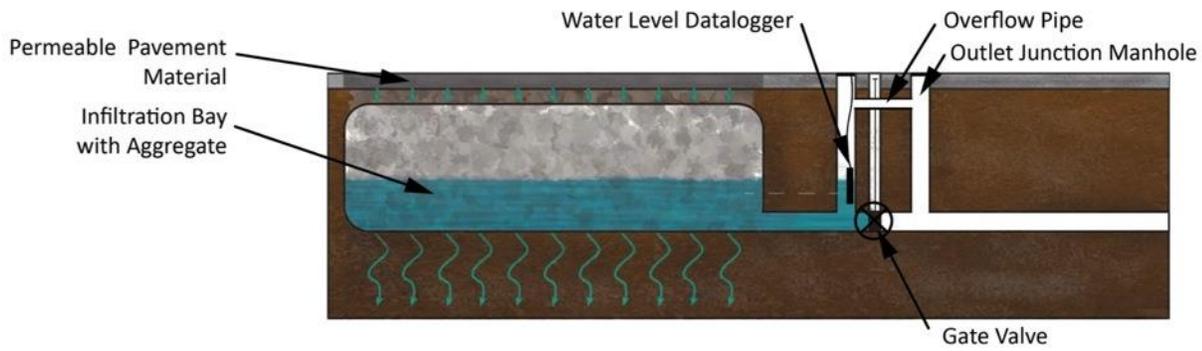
Cross section of pervious parking bays, the underground water storage cells, control valving, and water level datalogger location.
